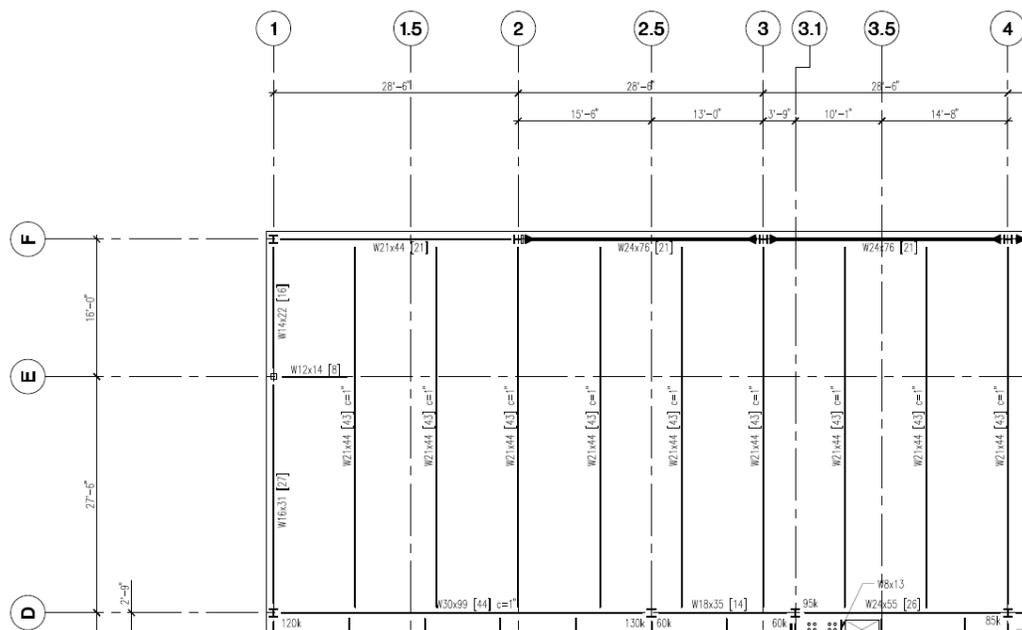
Typical Composite Slab Partial Plan (Level OL3) (Source: Cagley & Assoc. Drawing S-207)
